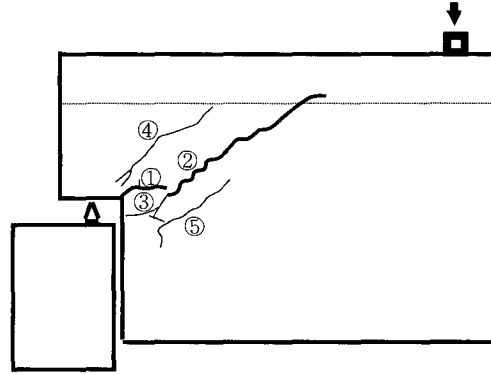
Example of shear cracking at failure stage (G-1-A)
